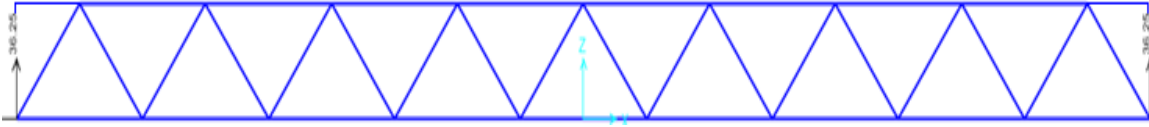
A SAP 2000 illustration of the steel truss and its reaction forces.
